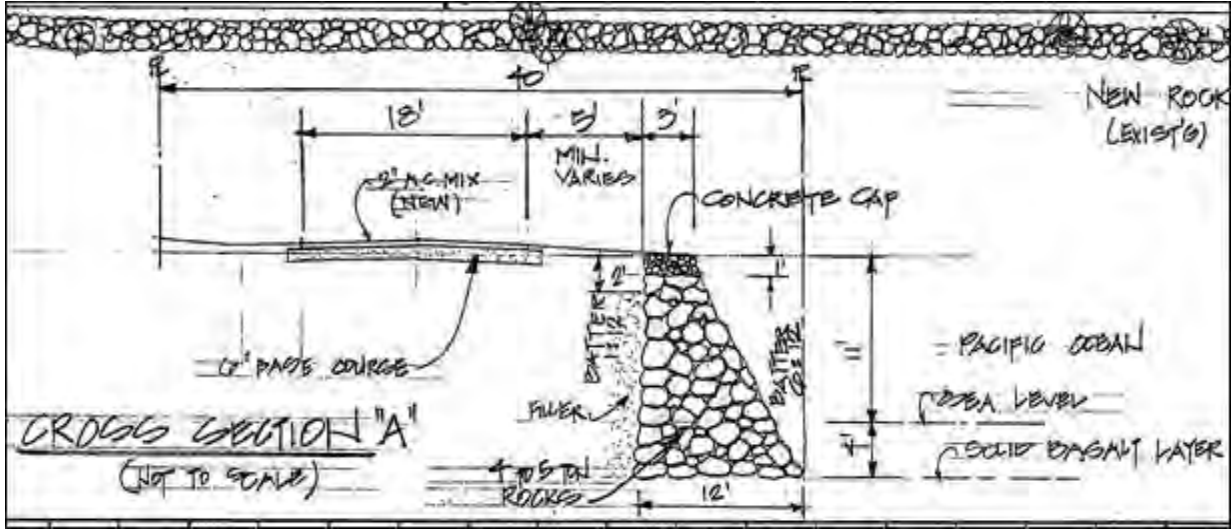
As-built Cross Section of Southern Reach of Revetment
